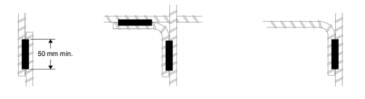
Welded joints (suitable for lightning current and EMC purposes)
